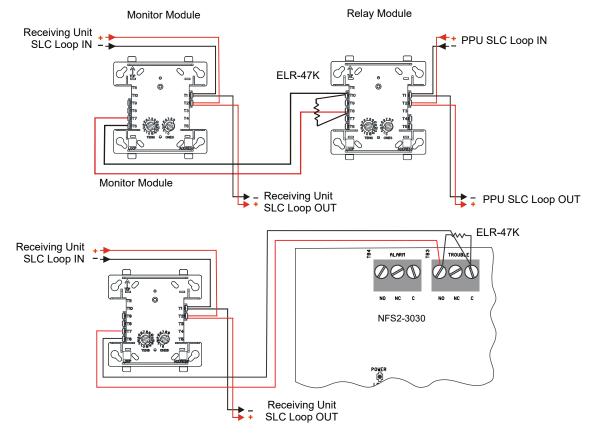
Typical Proprietary Fire Alarm Systems Wiring Connections: Detail Views
